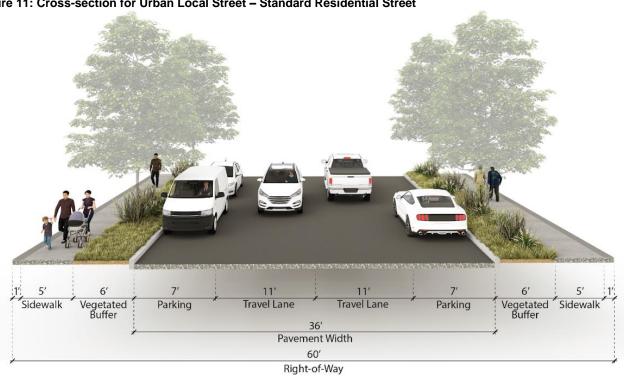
Cross-section for Urban Local Street – Standard Residential Street
